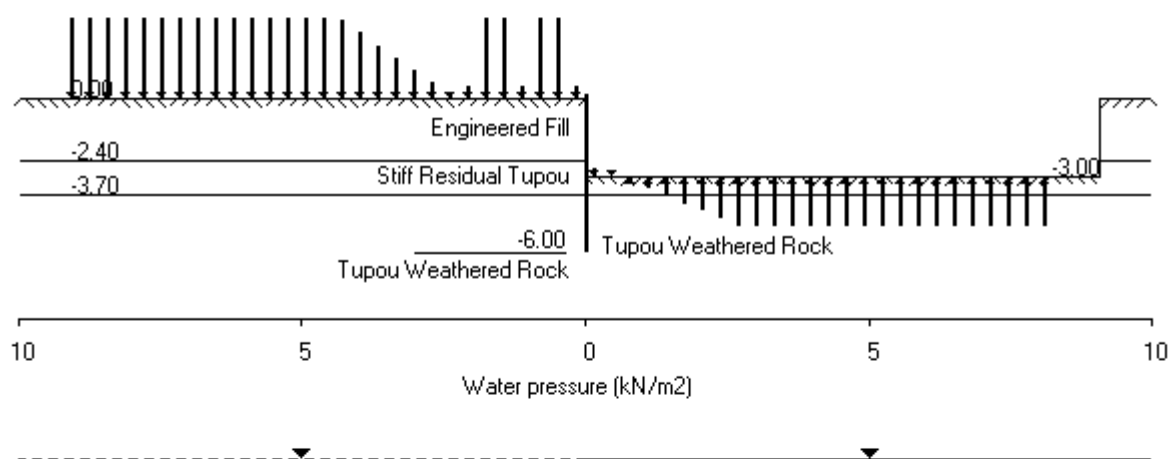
Wallap model with downslope surcharge loading and HN-HO-72 loading
